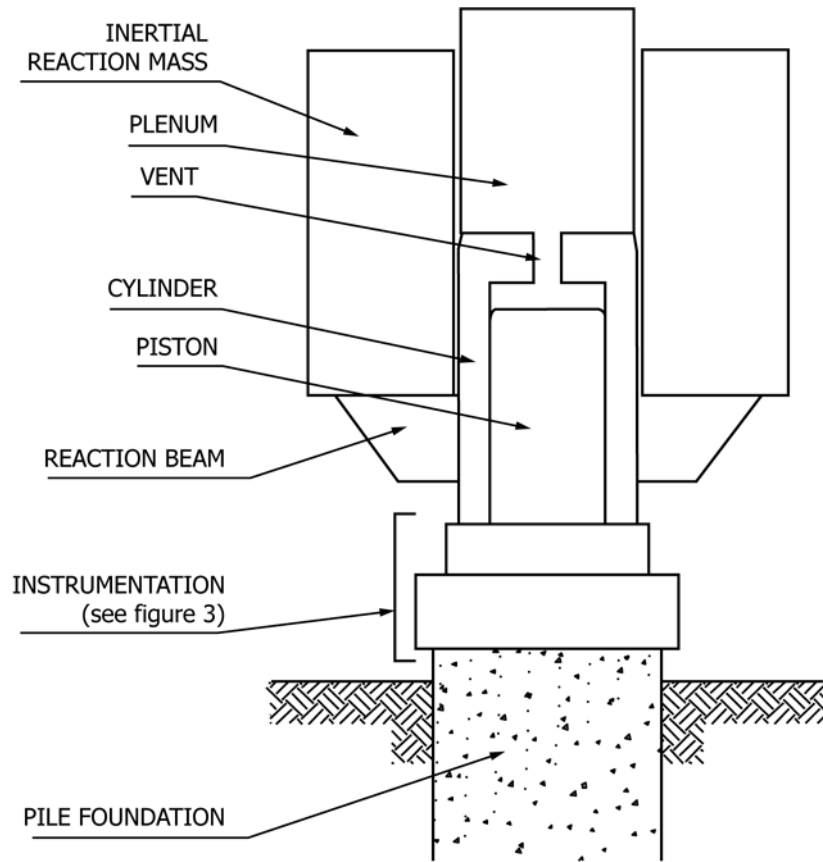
Schematic of a Combustion Gas Pressure Test Apparatus
